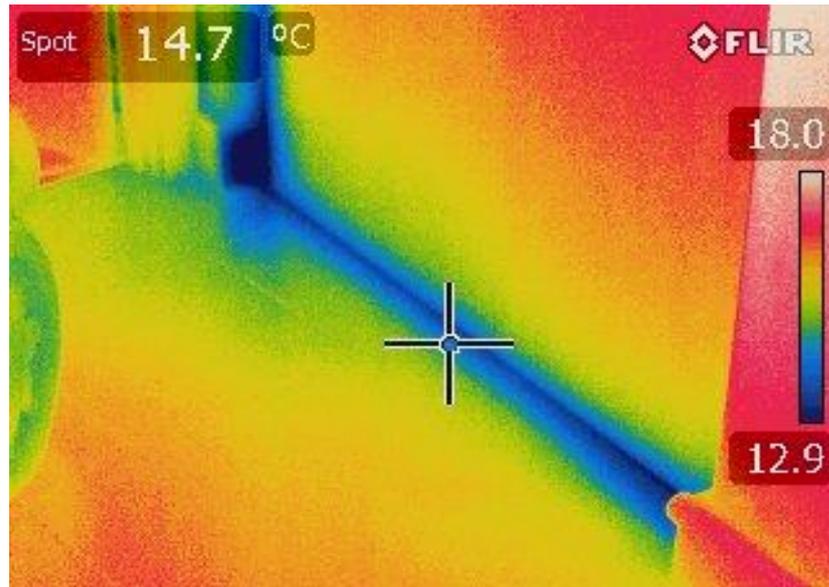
Door into Dwelling from Unheated Garage Phase 1 Heat Loss
